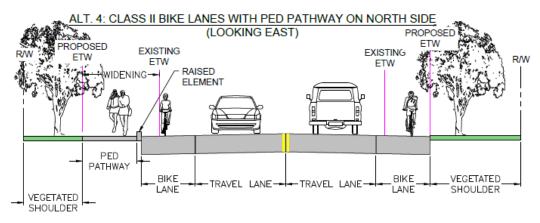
Coleman Avenue (County of San Mateo) Alternative 4
